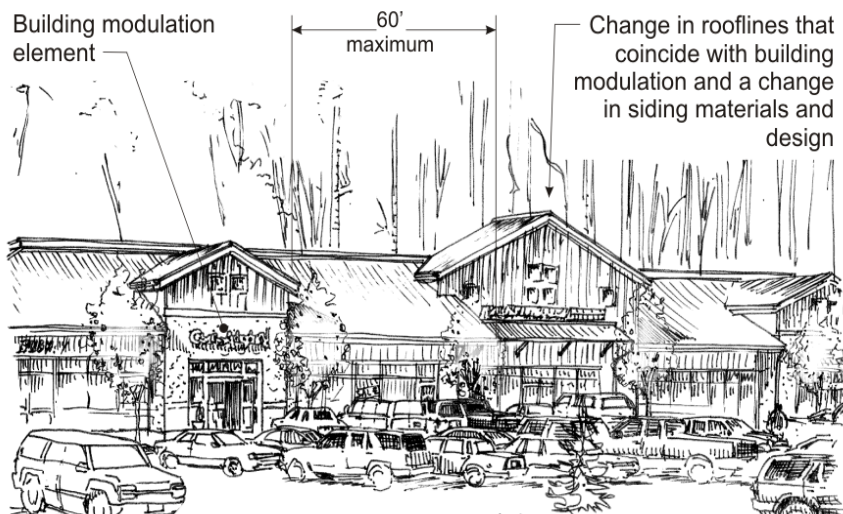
This example shows a commercial building with facade articulation every 60 feet.
